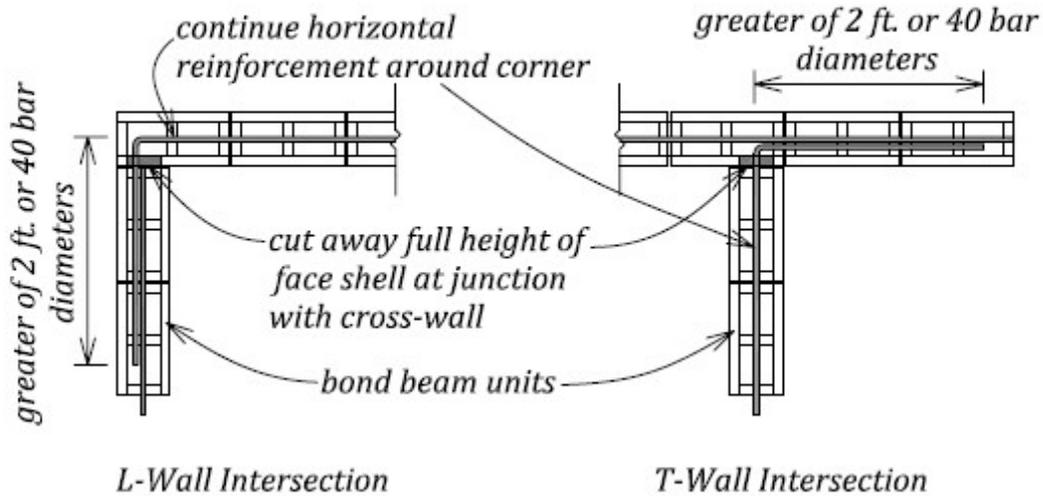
Horizontal reinforcement at the web-to-flange intersection: TCCMAR recommendations.
